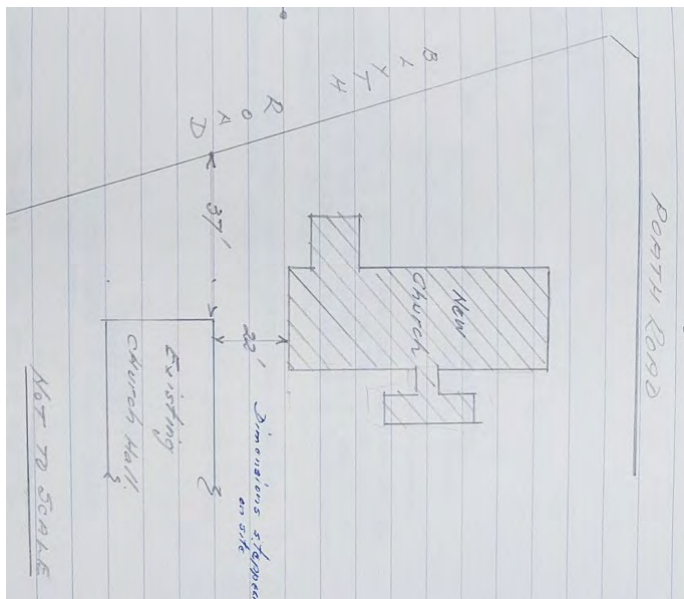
Site plan showing the site of the new church in relation to the relocated timber building (“Existing Church Hall”), 1960 (Source: PROV, PB file)
